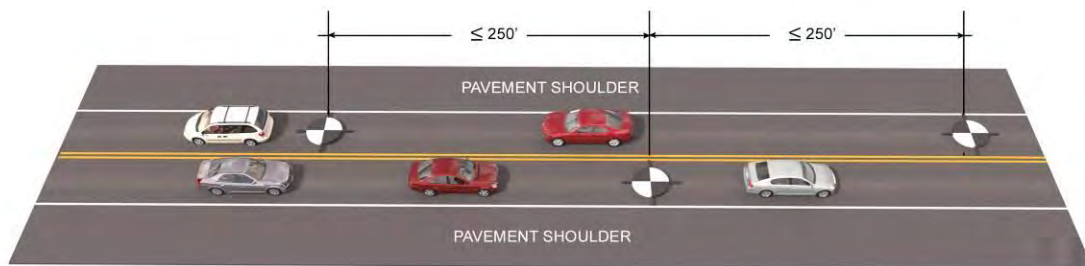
| Example of Soil Test Boring Layout for a Two-Lane Road
